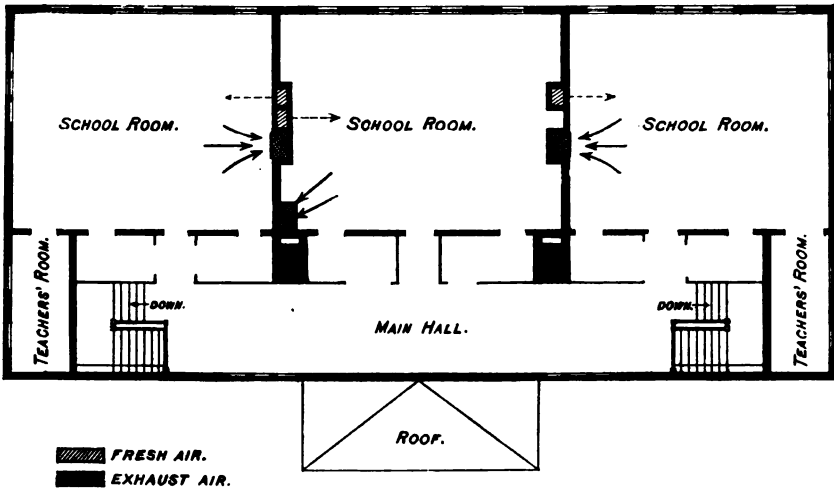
The Bryant school, Great Barrington, Mass. (Second floor plan.)
